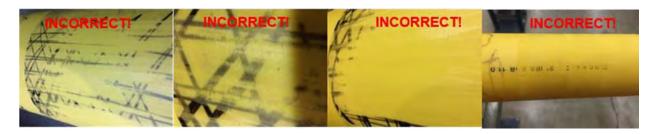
Figure X-s - Incorrect Scraping! Improper surface preparation / Not enough material removed, marks still visible.
